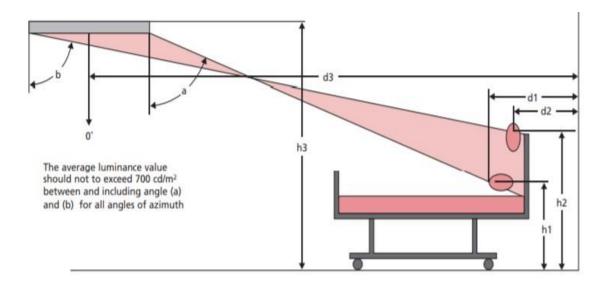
Elevation Angles for Bed Head Rail Mounted Luminaires
